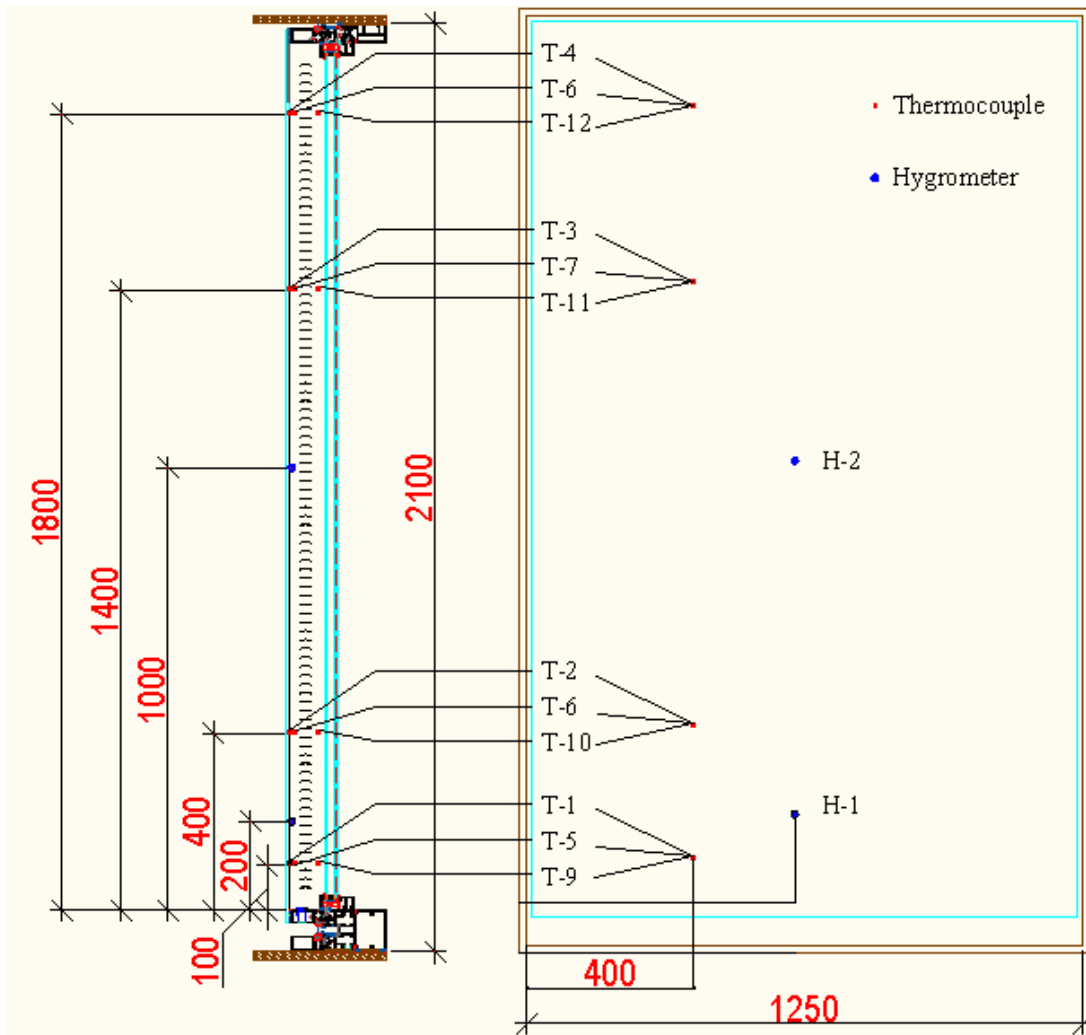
Section detail (left) and plan detail (right) placement of thermocouples and hygrometers.
